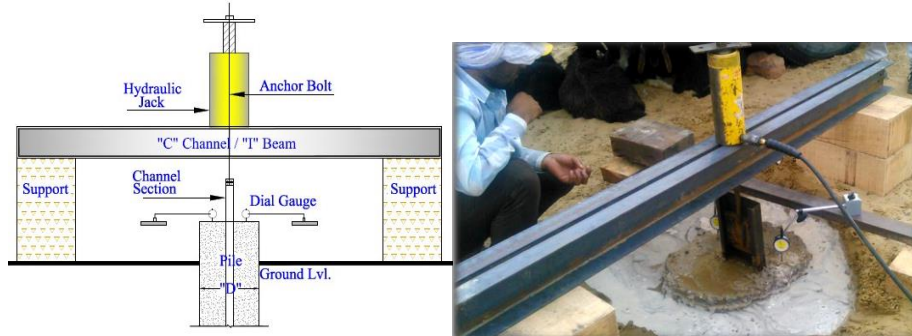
Test arrangement for pile pullout test. Sketch on left is a schematic of the test setup. Photo on right shows test in progress.
